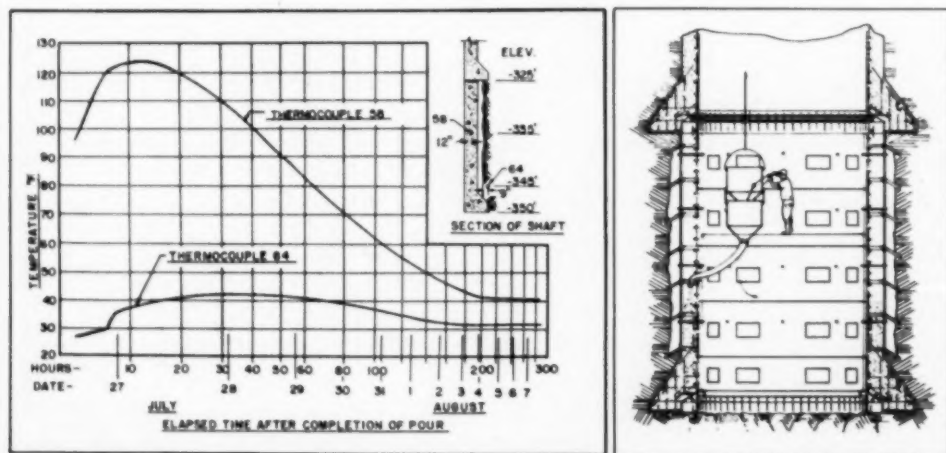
Graph (left) of soil and concrete temperatures as measured by thermocouples at 325 to 350-ft depth. Sketch (right) shows placement of concrete in a 25-ft section.
